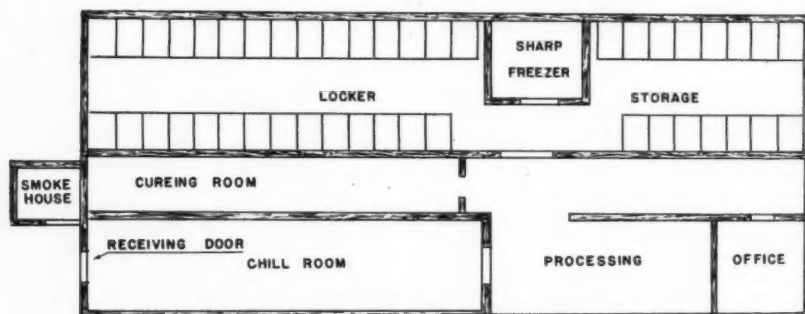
Floor plan of a locker plant with the freezer inside the locker room.
